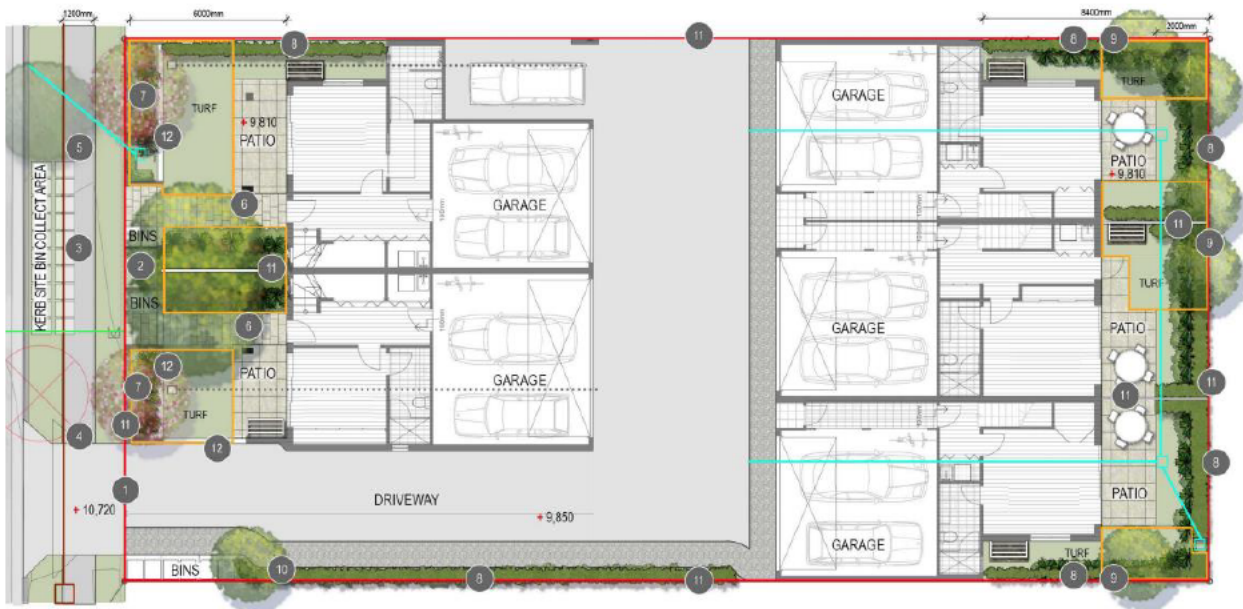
Example Ground Level Site Plan of Townhouse (Orientated to Street/Modulated)
